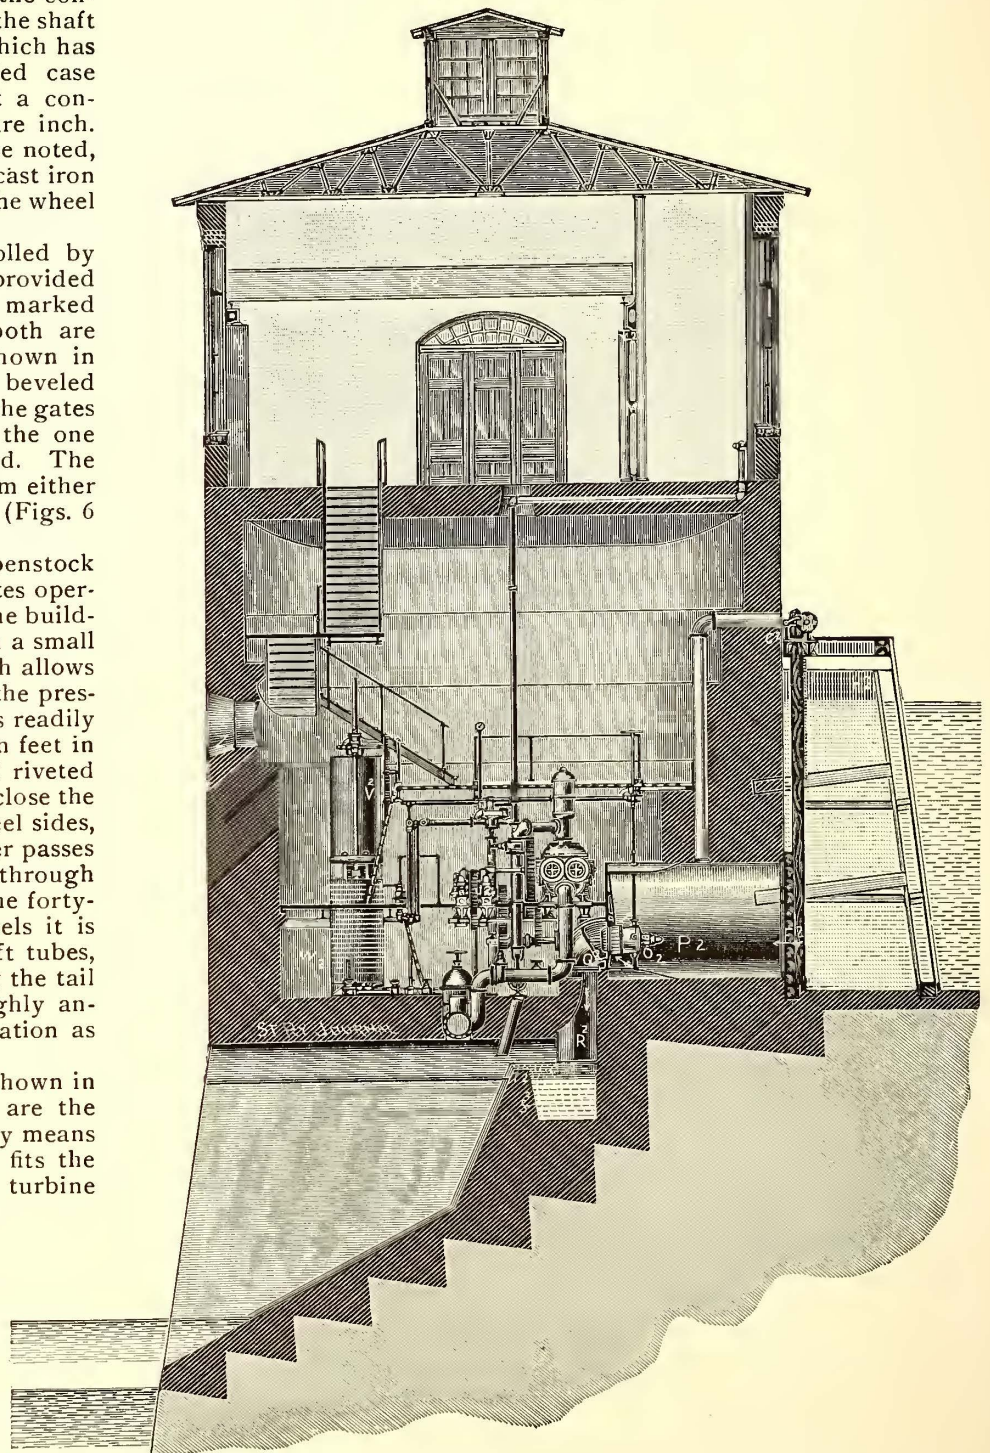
SECTIONAL ELEVATION OF PUMP ROOM, LOOKING UP STREAM—PORTLAND, ORE.
